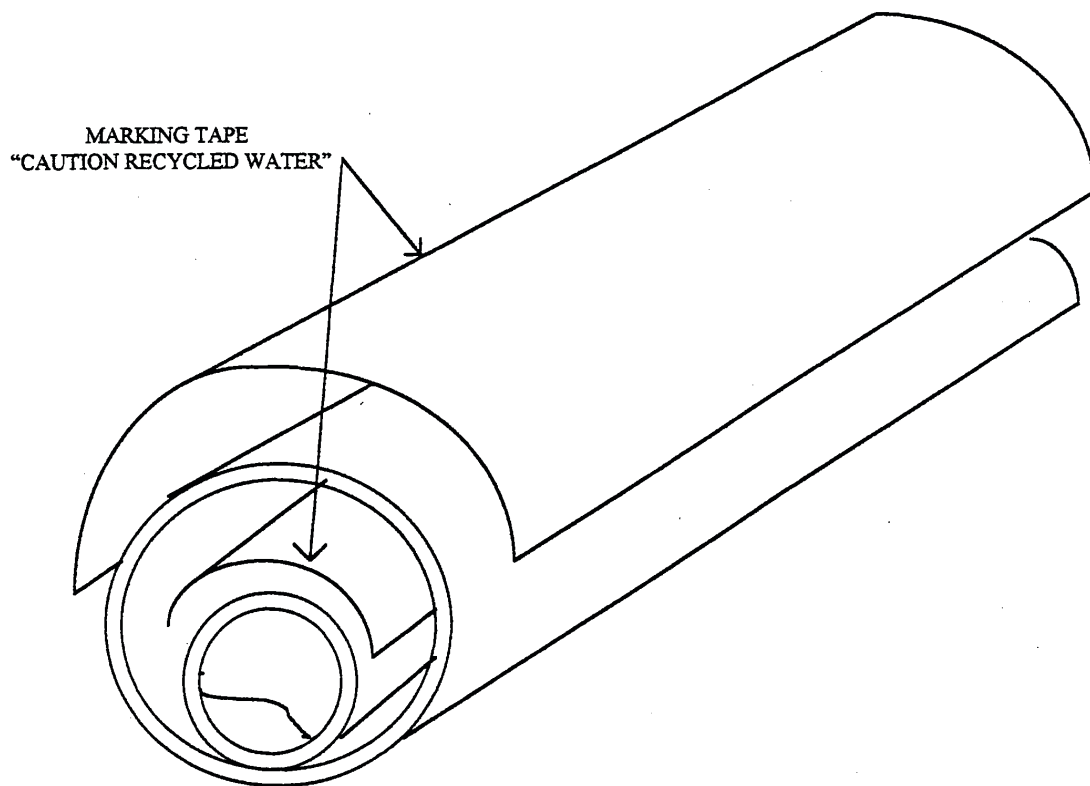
DIG IN PROTECTION INSTALLATION
